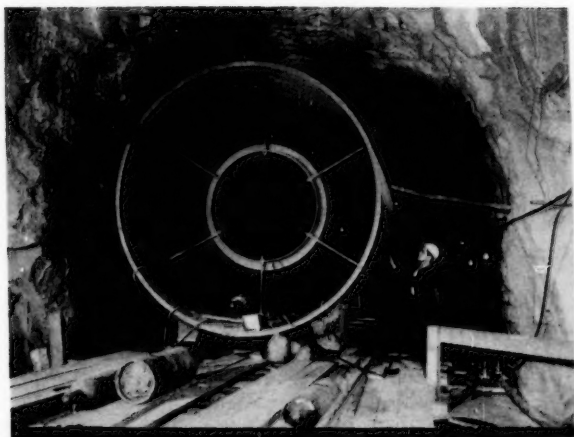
BERSIMIS No. 1      STEEL LINER IN TUNNEL
